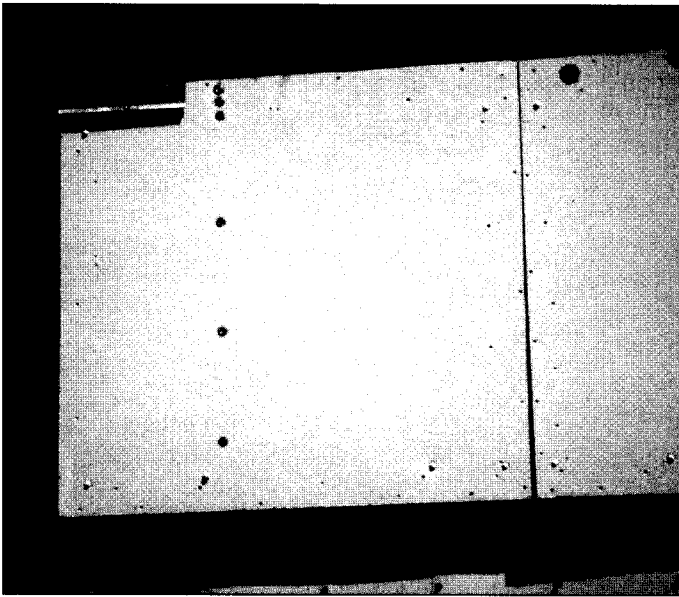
Pressure taps installed on flashing surface and in wall. Pressure taps in wall.
